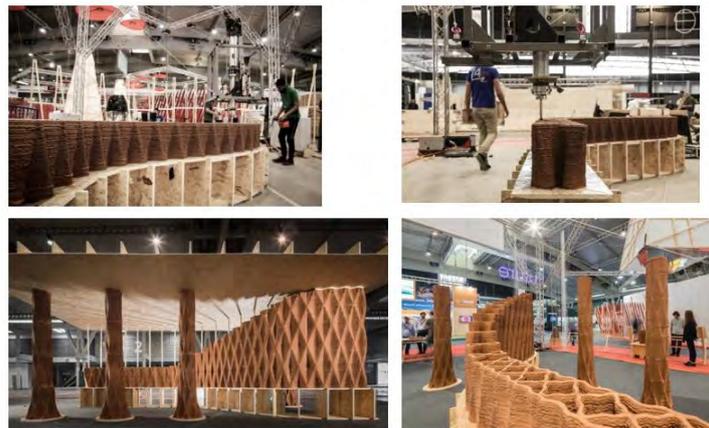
Robotos driven by cables & drones have helped in 3D printing using clay in printing large scale construction
